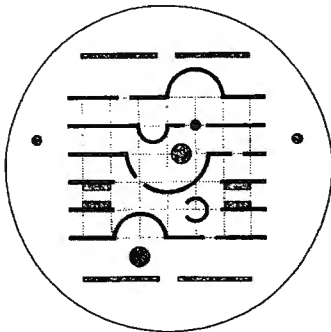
Aldo van Eyck: Pavilion at Arnheim. Ground plan.
